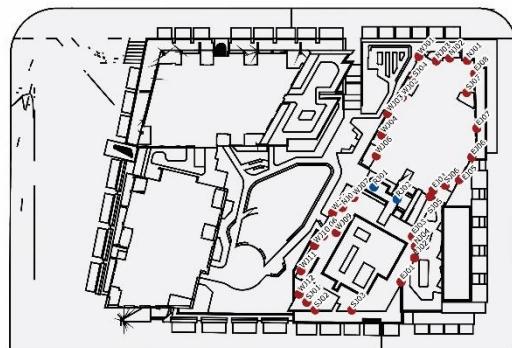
Layout of Pressure Sensors – Level 7 Plan
